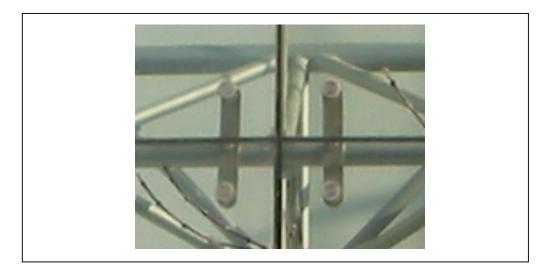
Two armed post mounted spiders of the façade Source: By author, 2003
